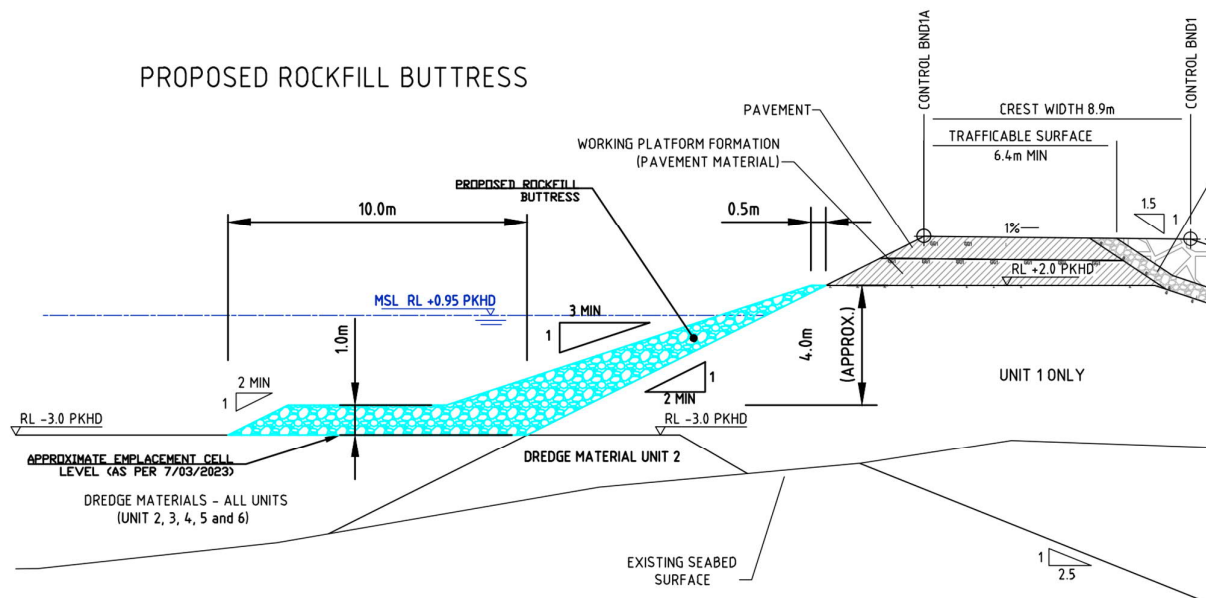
Typical Section showing the Rock Buttress (cyan)
